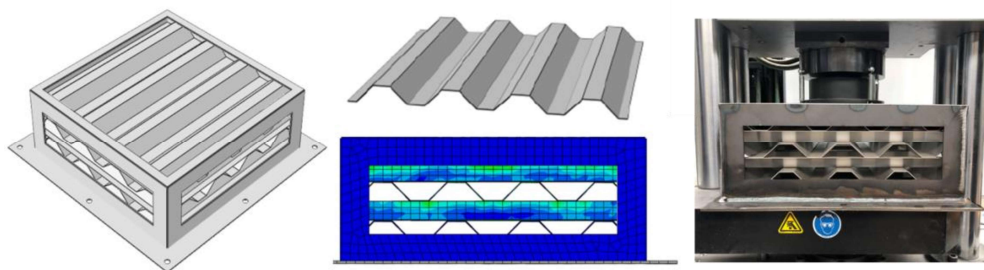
Geometry, numerical model and laboratory testing of the trapezoidal sandwich panel.
